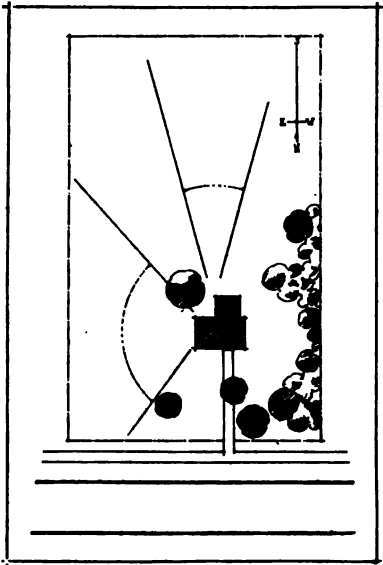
Planting plan to insure best effect of shade, outlook, protection, and privacy on a lot facing north
